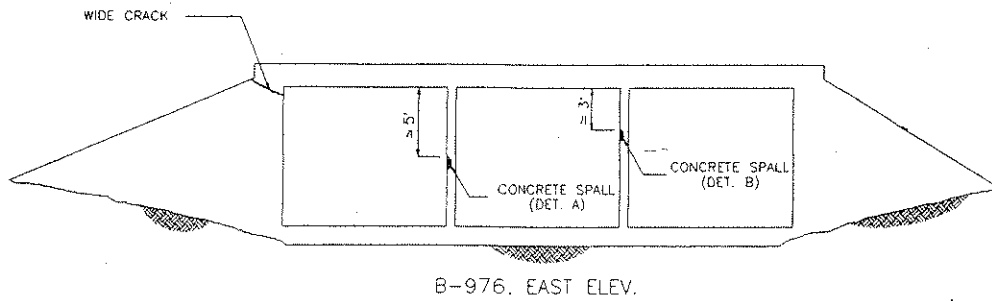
Spalled Concrete at the East End of B-976
